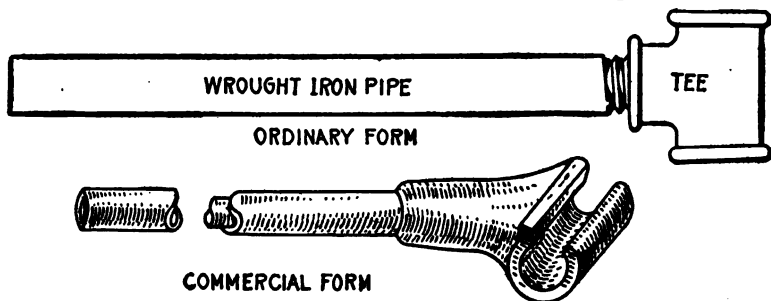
,139.—Ordinary form of hickey or conduit bender. It consists of a piece of one inch steam pipe about three feet long with a one-inch cast iron tee screwed onto one end of the pipe. This device is used as follows: the conduit to be bent is placed on the floor and the tee slipped over it. The workman then places one foot on the conduit close to the tee, and pulls the handle of the bender towards him. As the bending progresses, the workman should take care to continually move the bender away from himself, to prevent the buckling of the conduit.
